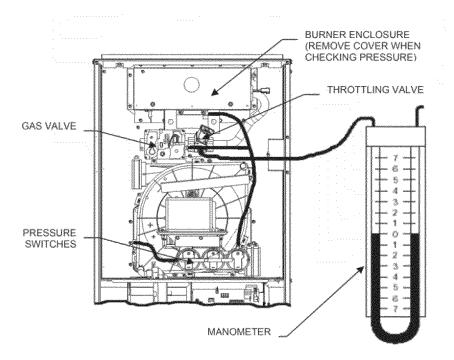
Adjusting Manifold Pressure (Manifold Attachment)
